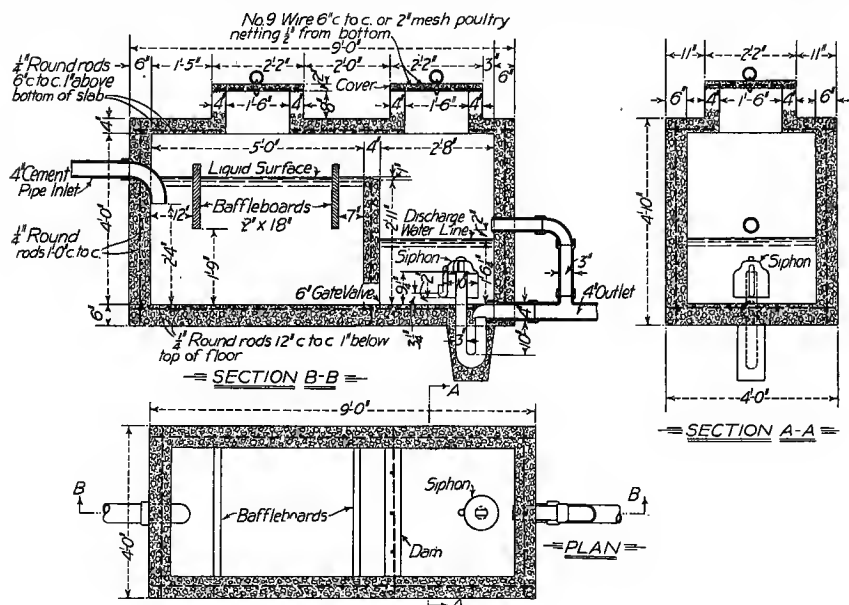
Septic Tank Same as Shown in Figure 2. This shows the construction as if cut away along a center line following its length, also a section of the siphon chamber and a plan of the whole construction.
